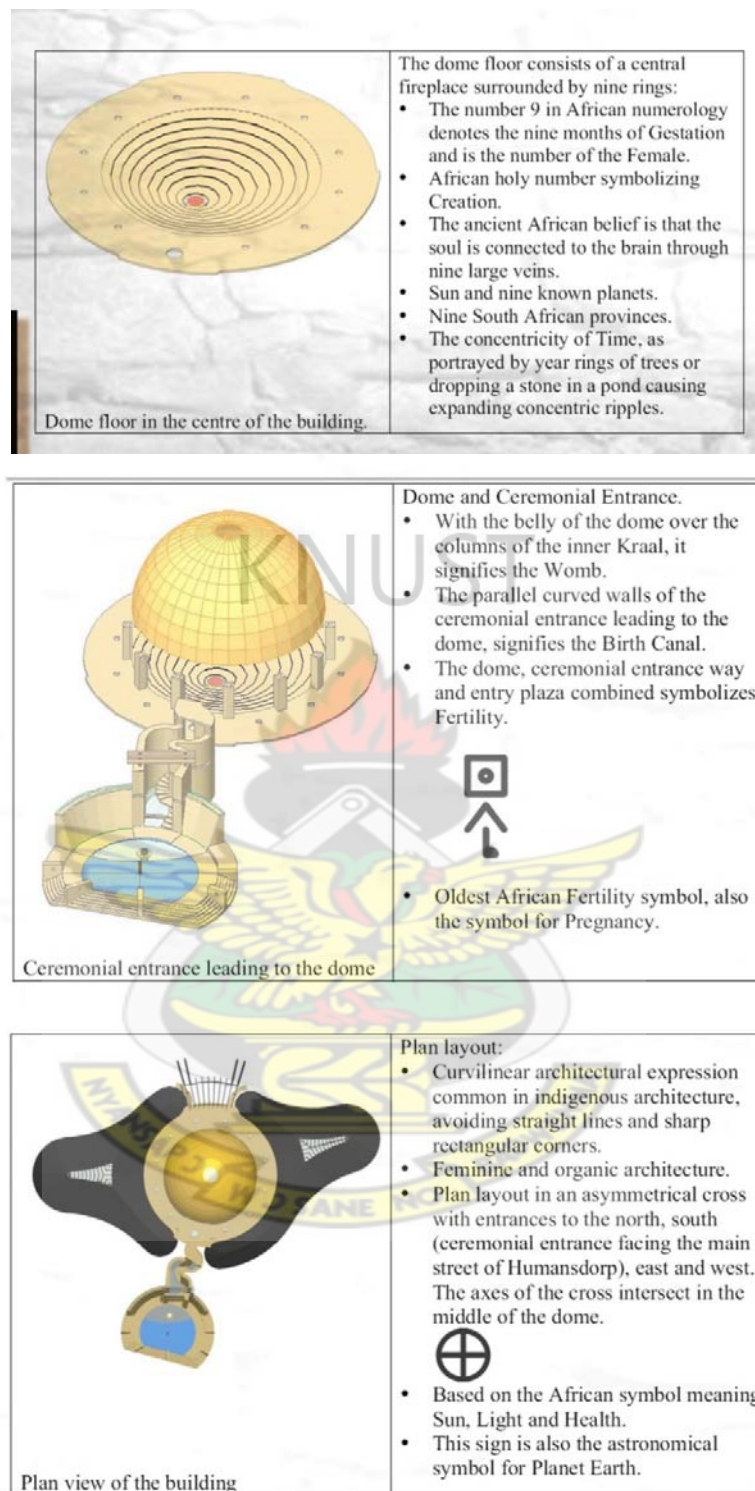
Dome, Dome floor and Plan view, Kouga cultural centre
